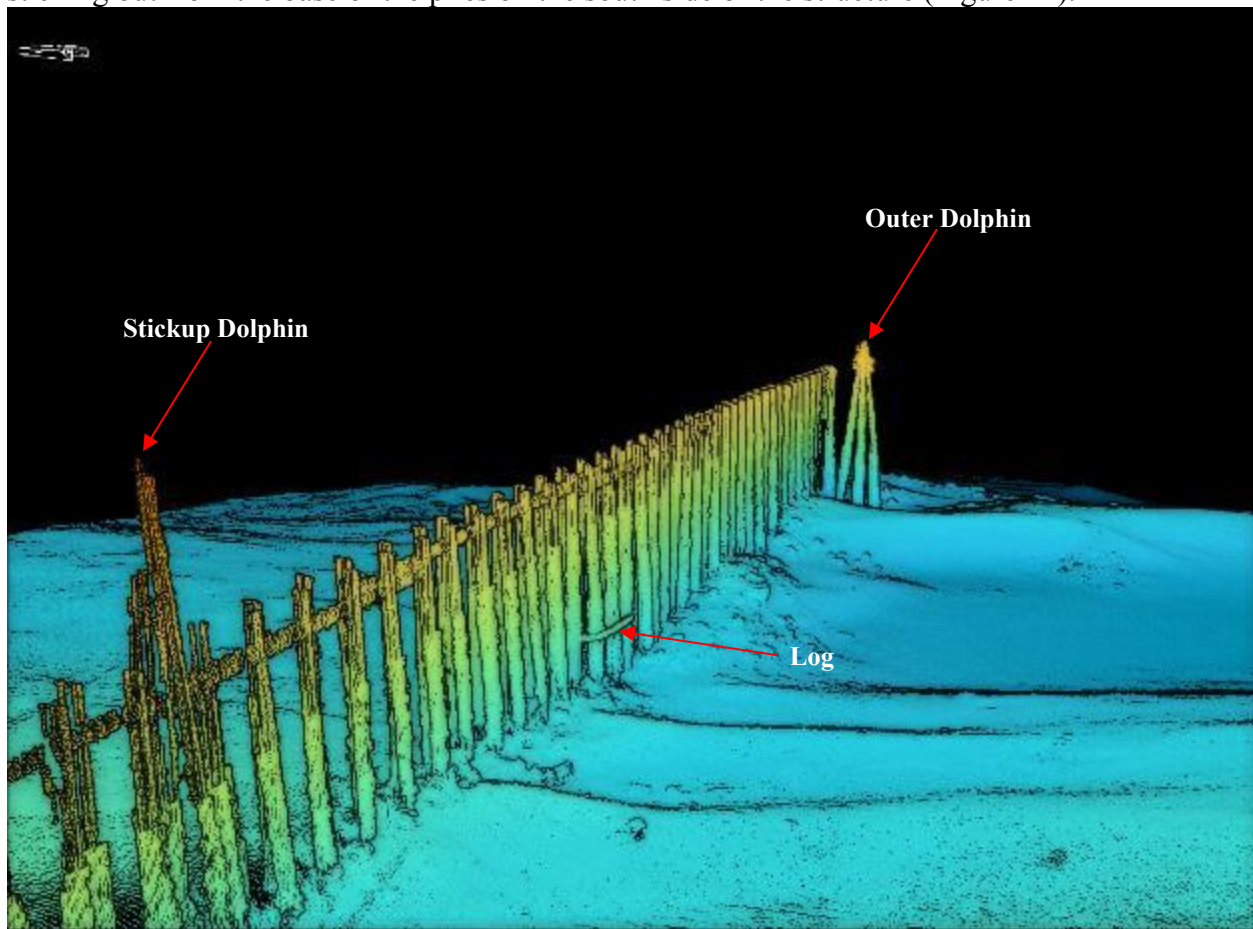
Pile Dike 6.6 point cloud viewed from downstream looking riverward.
